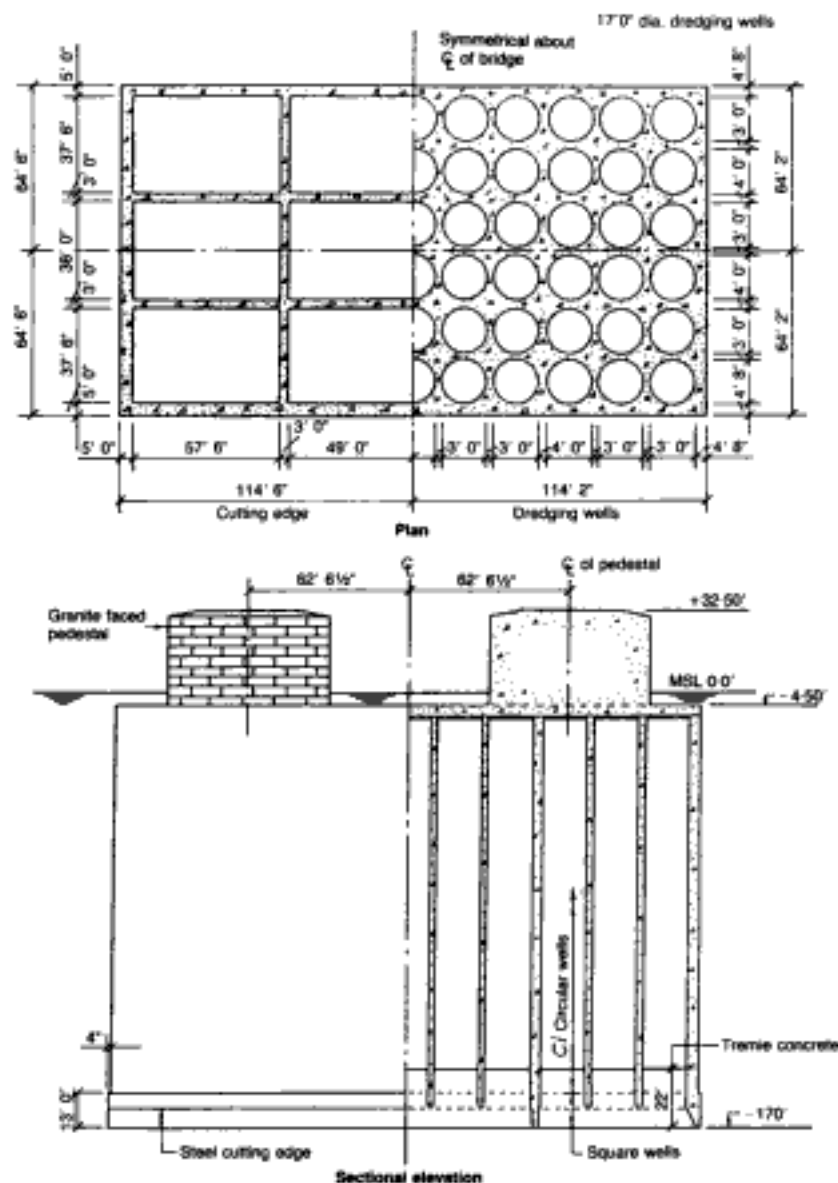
New York City Narrows Bridge, Brooklyn pier: caisson plan and sectional elevation (Yang¹⁹)
